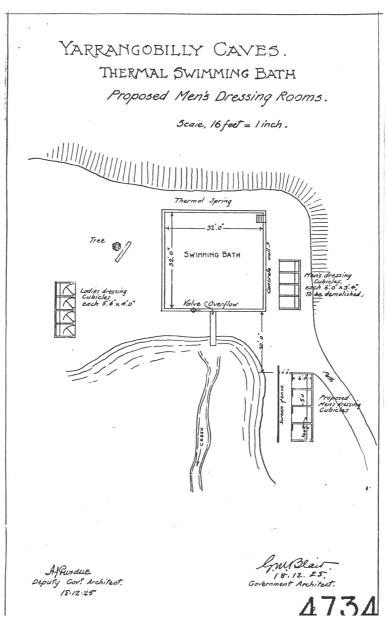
\underline{5}4$ A 1925 plan of the Thermal pool showing two rows of dressing sheds and an enlarged pool.
